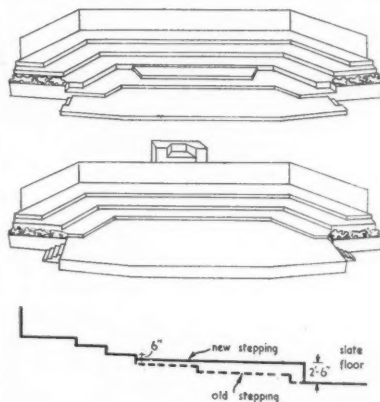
Top, the original orchestral platform, and centre, the new raised platform.
